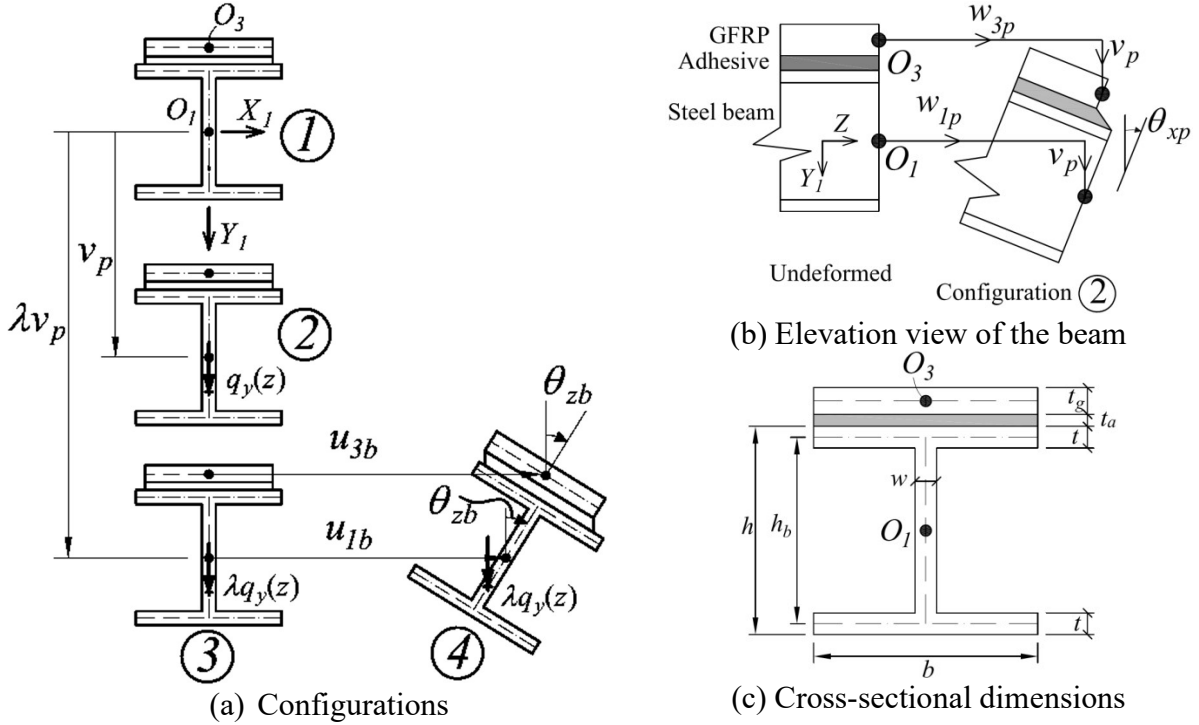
Beam configurations (a, b) and cross-sectional dimensions (c)
